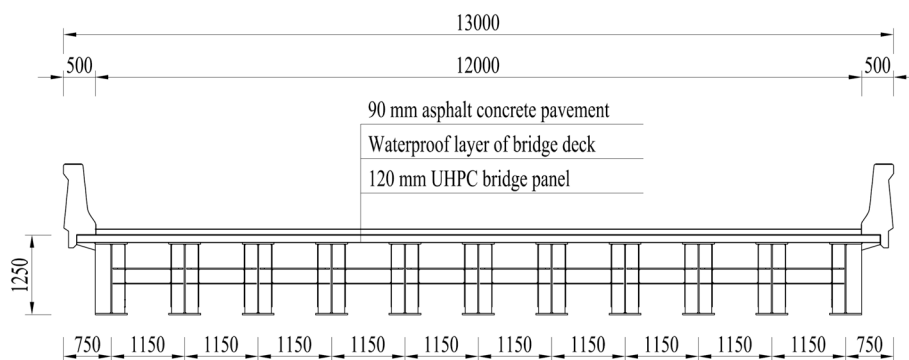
Standard cross-sectional layout of the lightweight steel-UHPC composite beam (mm)
